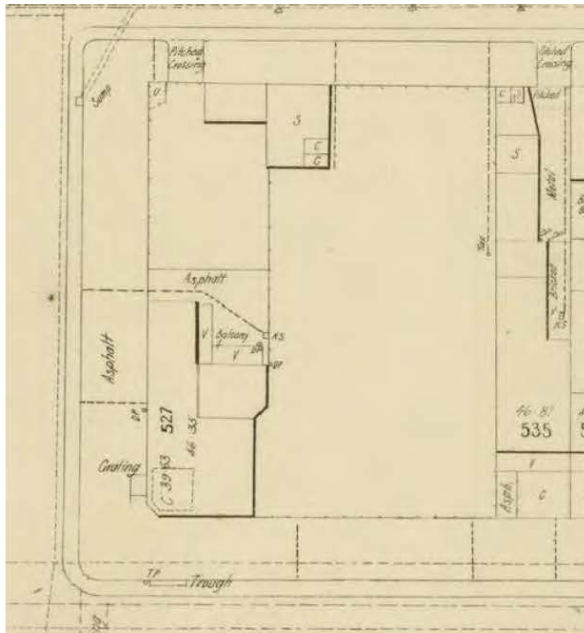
Footprint of the earlier building on the corner site in 1901 (MMBW DP1086, 1901).
